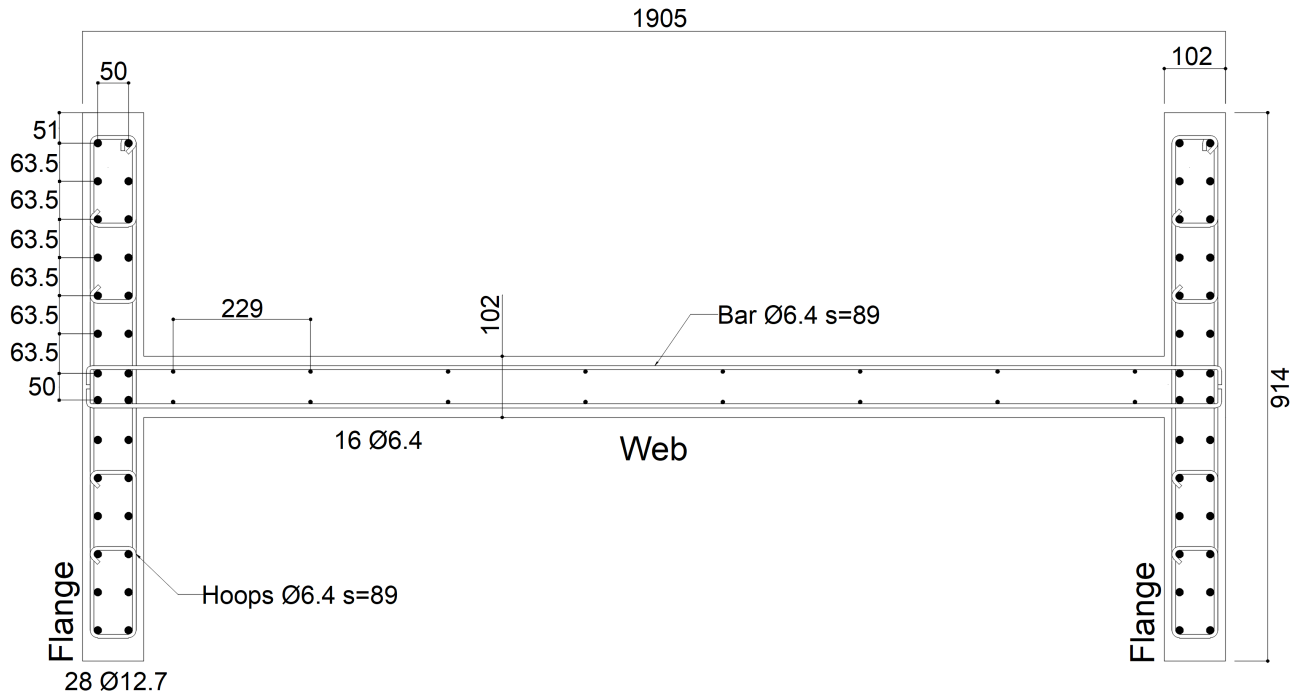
F1: Cross section and reinforcement detailing [Unit: *mm*].
